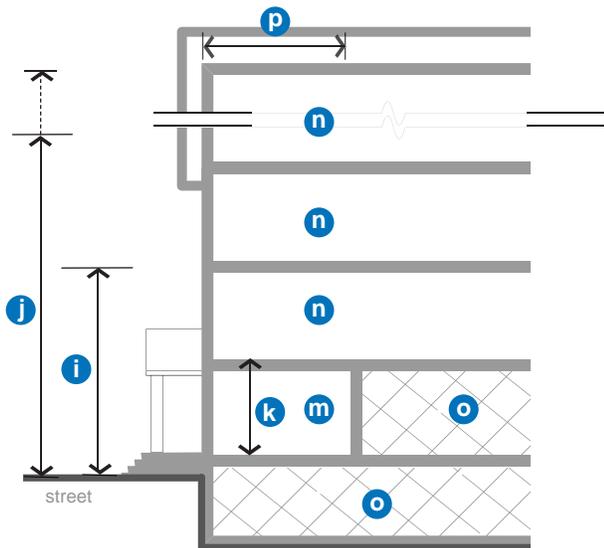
(2) Townhome Building: Height and Use Requirements
